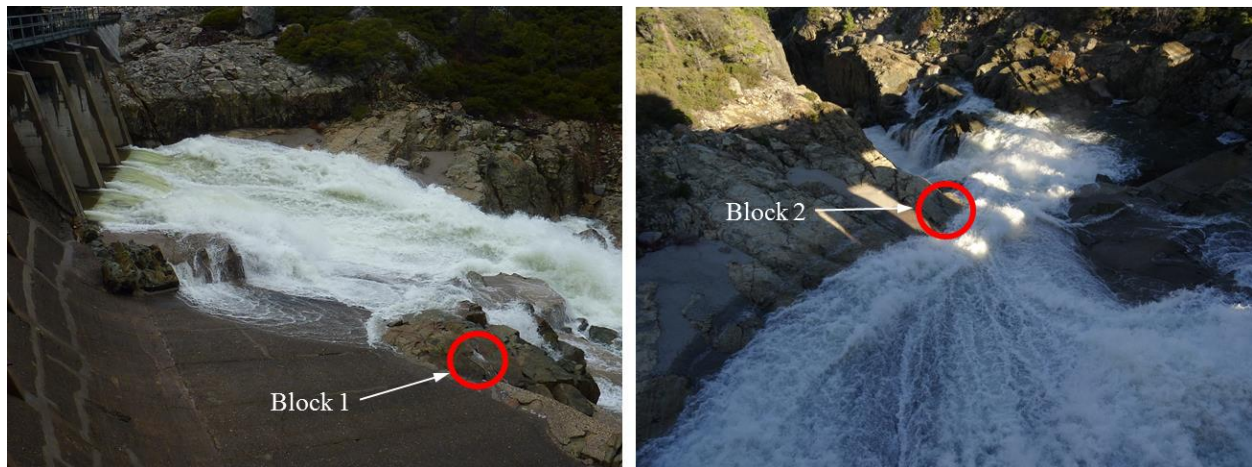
Spills at Spaulding Dam No. 2 on 12/4/12 (left) prior to installation of Block 2, and on 2/10/15 (right) barely missing edge of Block 2.
